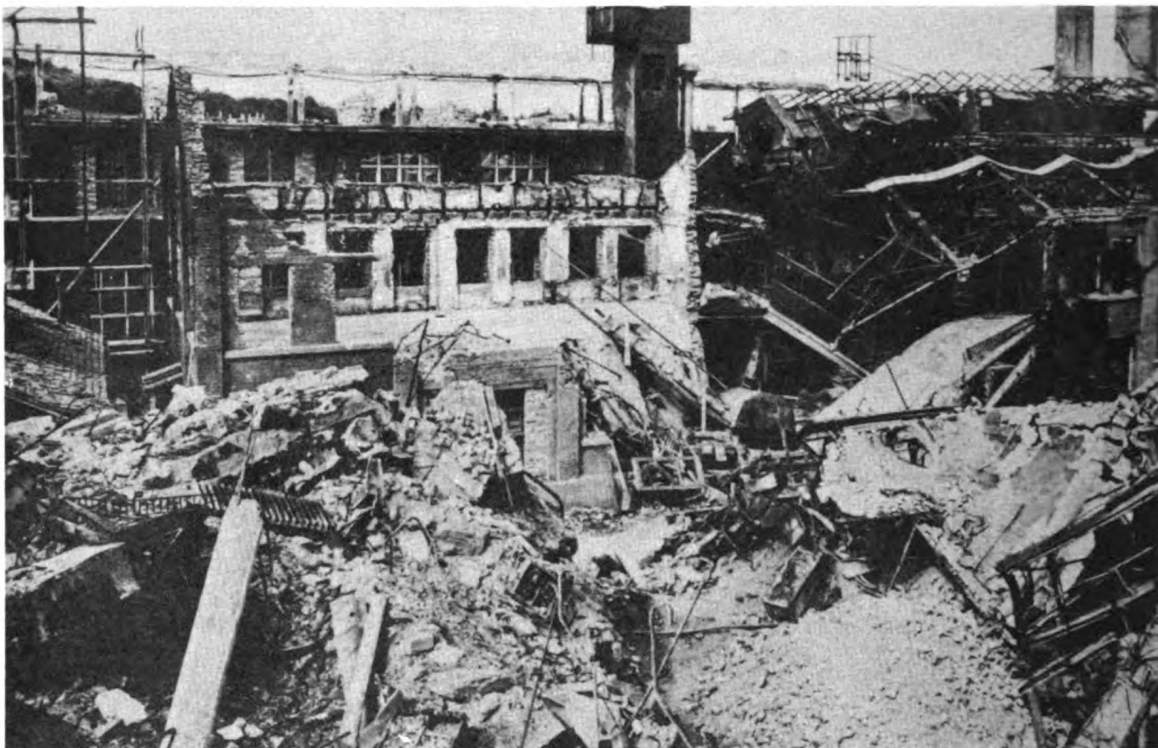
View showing extensive blast and fire damage to reinforced concrete frame and steel frame structures. Note bomb crater, lower left corner and repairs to damaged curtain walls. Reproduction of captured photo.
